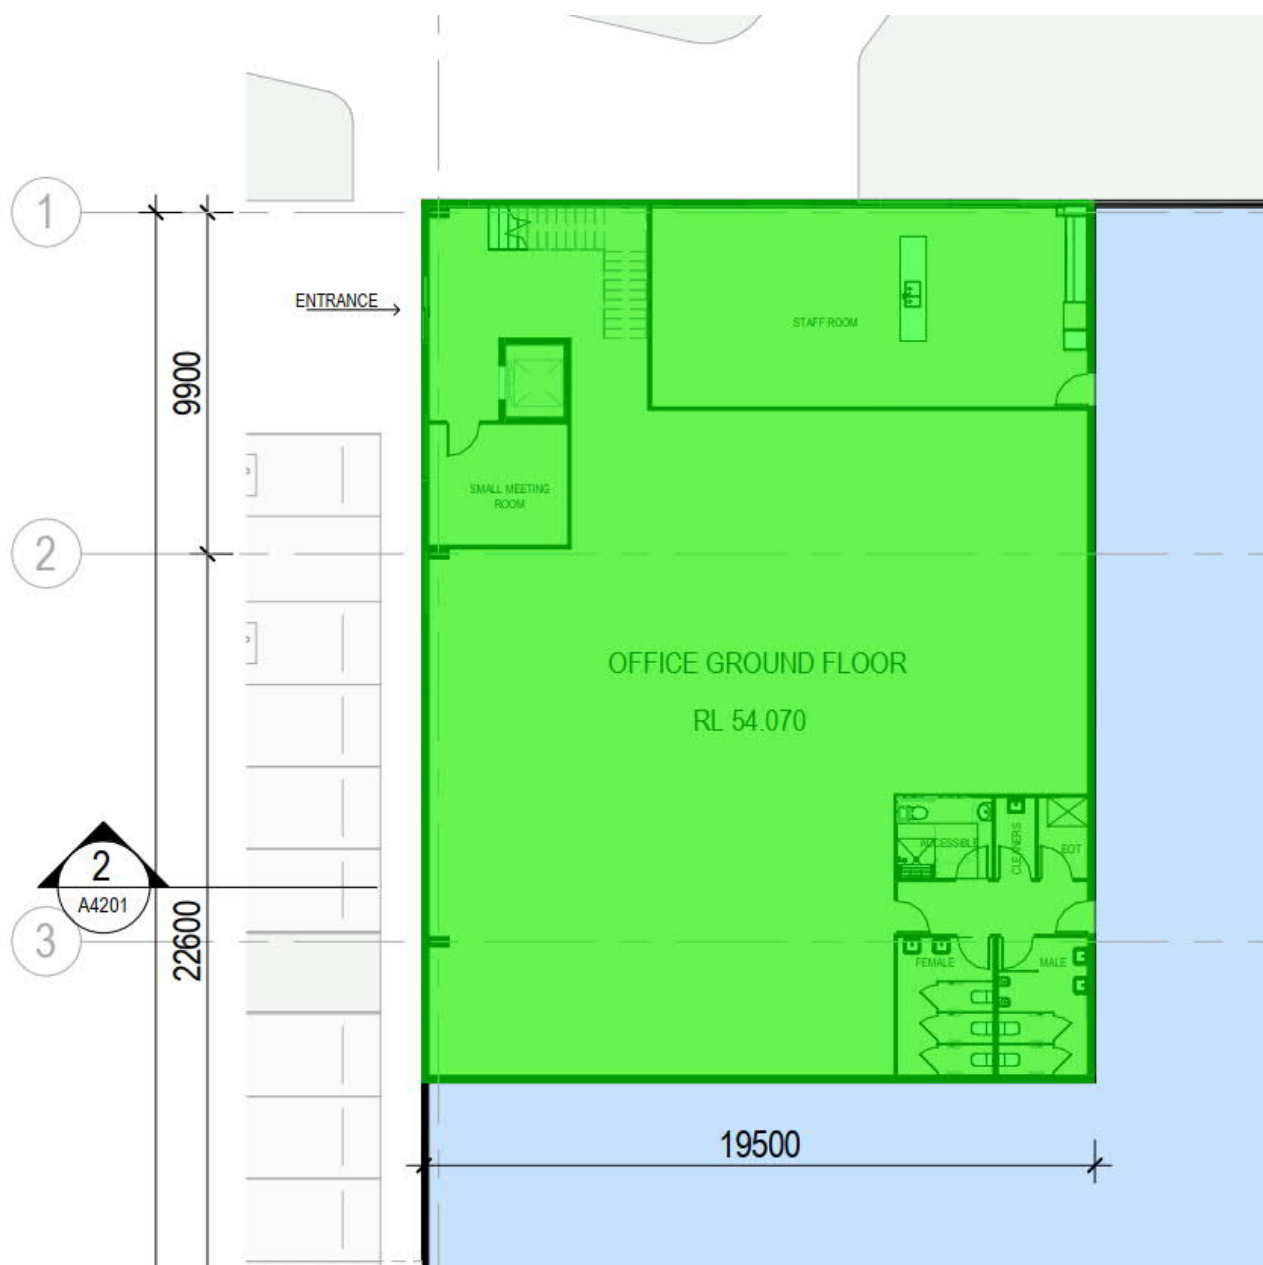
Underfloor insulation requirements for 16 McLaren Drive Ground Floor above Warehouse Undercroft
